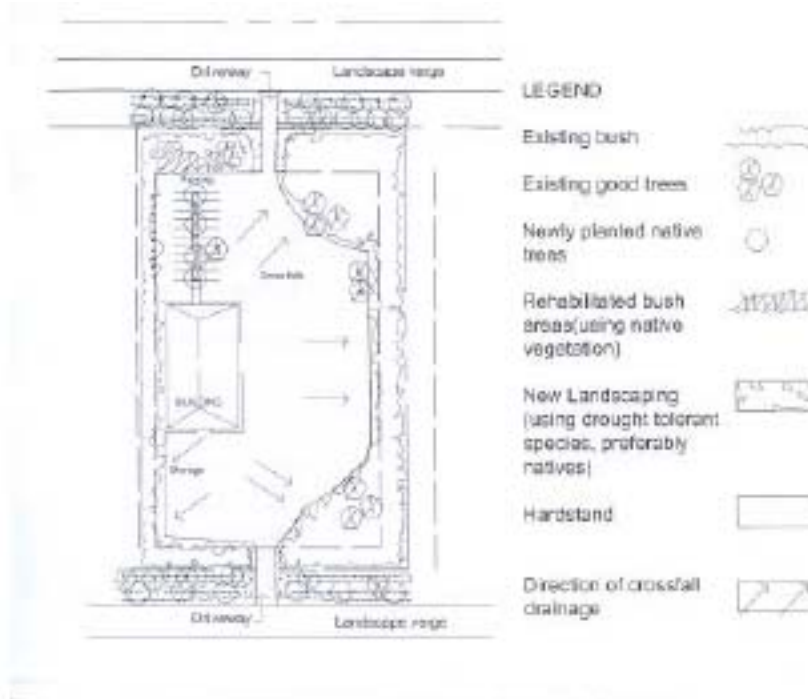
Typical Dual Access Lot Layout and Set-backs
